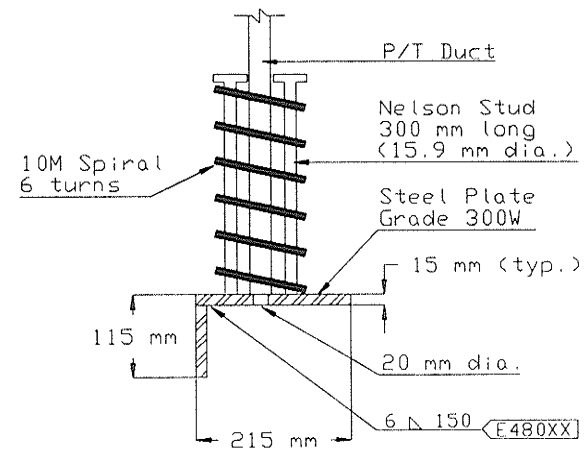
Specimen PTS, PTB and PTB-S Reinforcement Details
